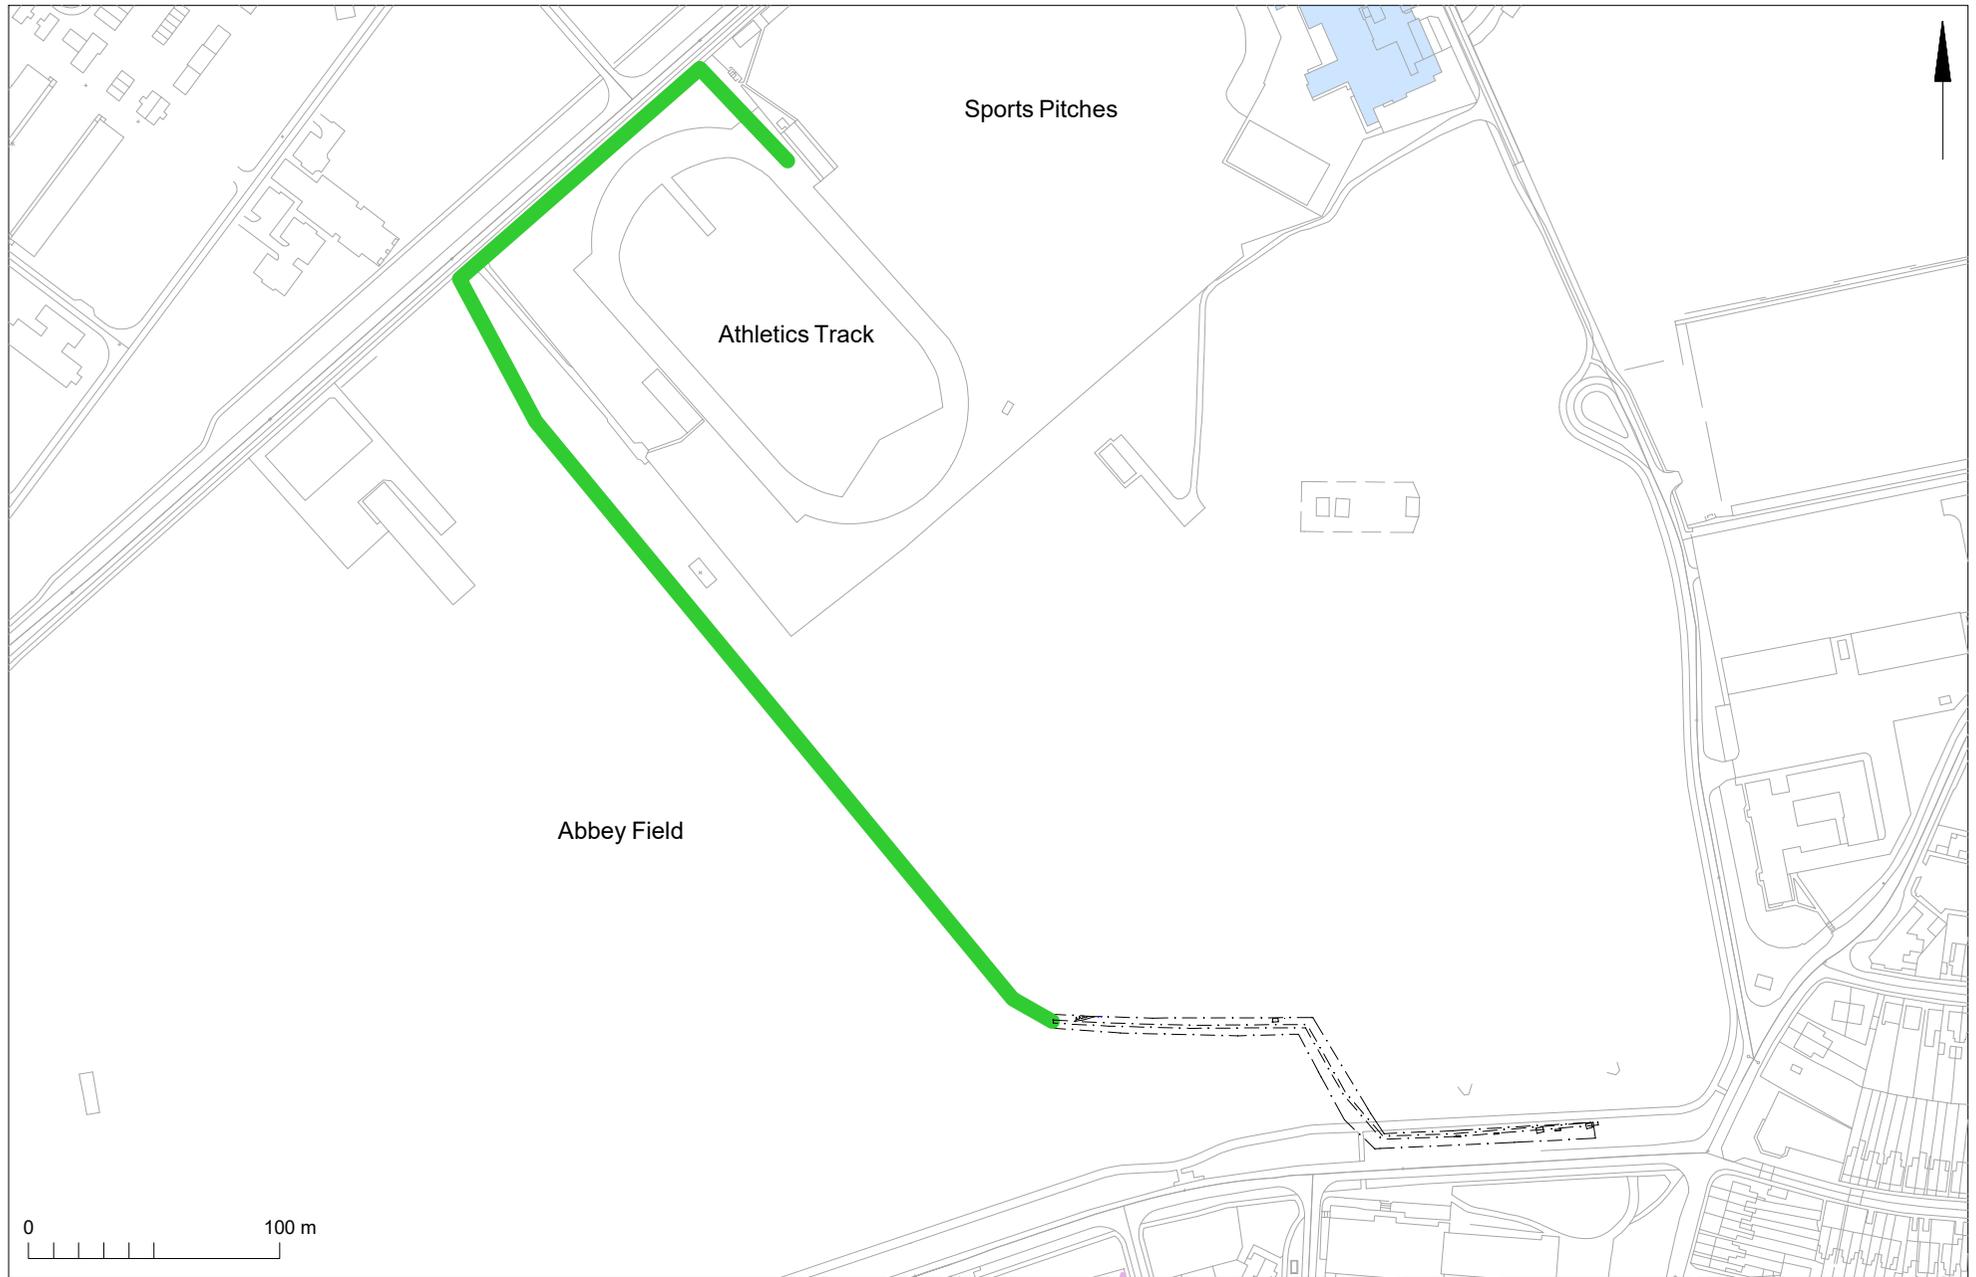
Site plan. Area in green not monitored as works did not require excavation.
